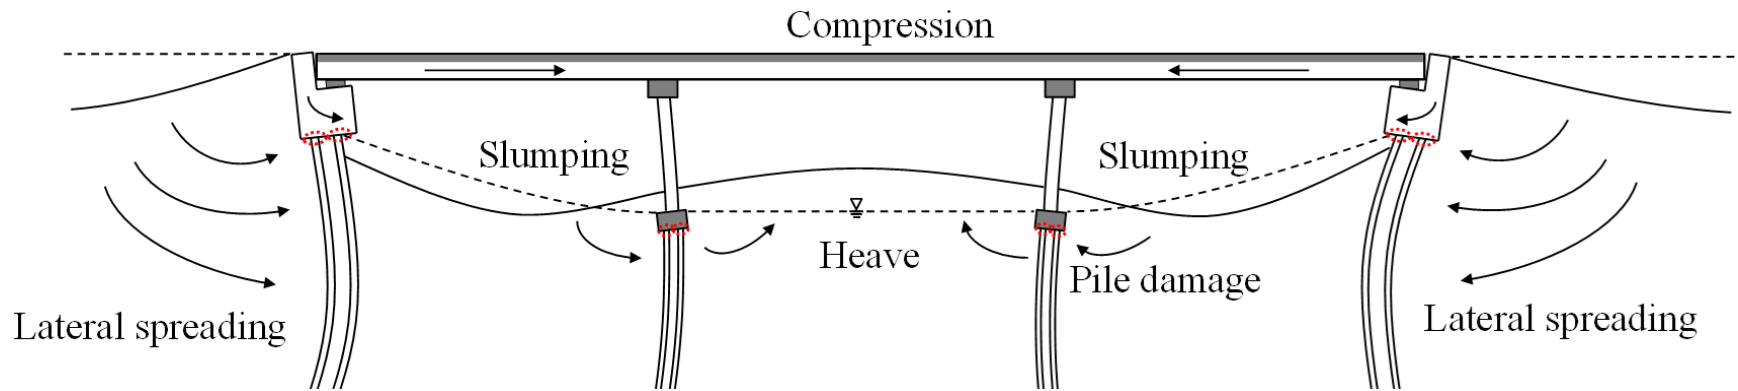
Schematic illustration of the liquefaction-induced bridge and ground deformation mechanism.
